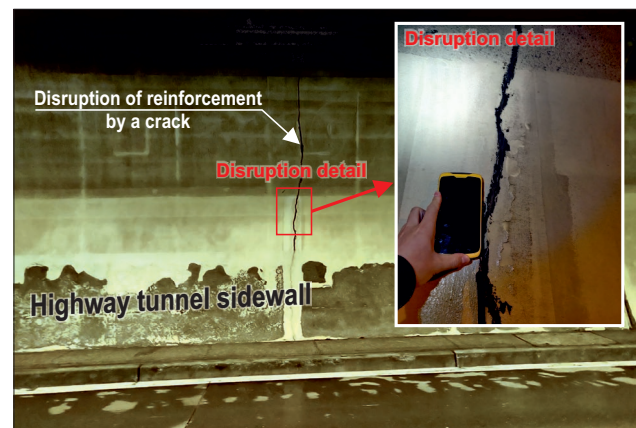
Disruption of reinforcement by a crack on the highway tunnel sidewall with detail of the sealed and repaired crack (Photo: D. Grega).
